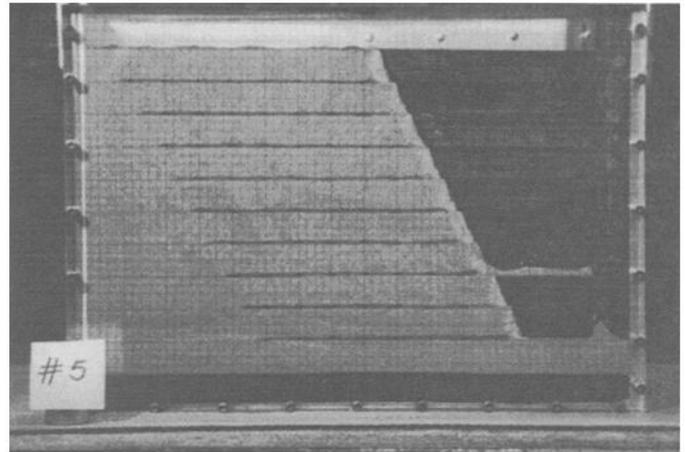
Centrifuge model, still with wooden supports in place, after completion of construction.
